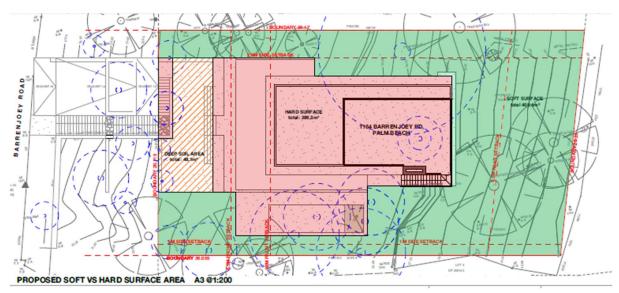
Extract of Landscape Calculations Plan Source: Rama Architects
